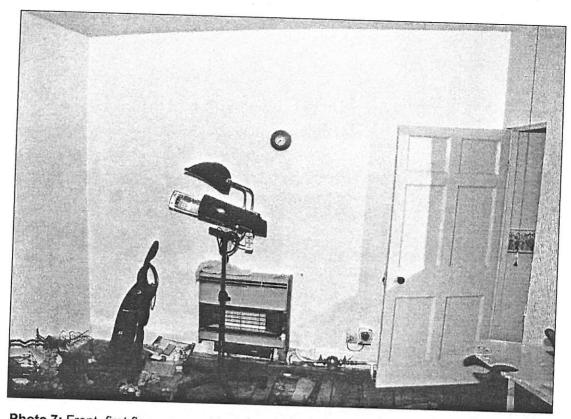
Front, first floor room, with original door and floorboards. Fireplace removed.
